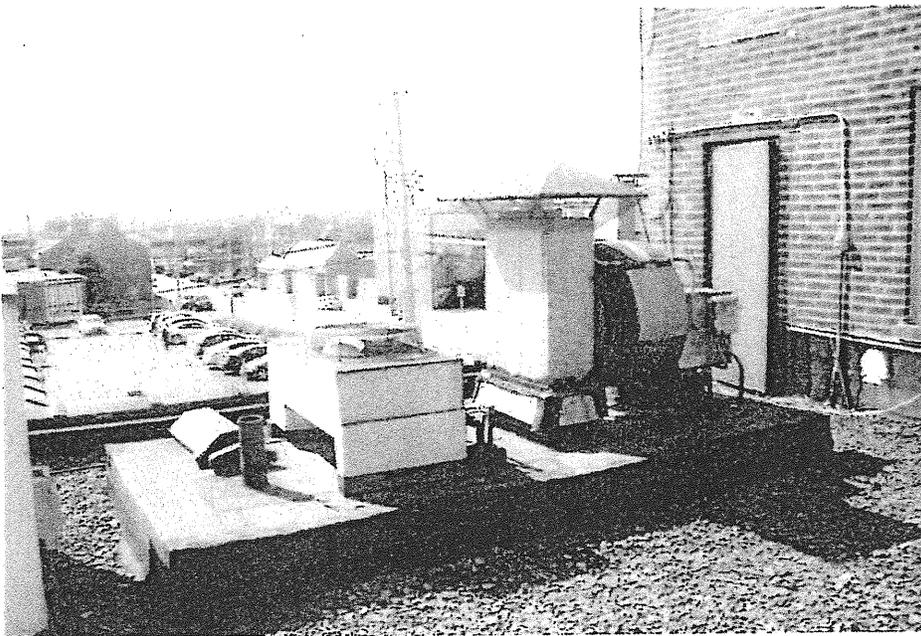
Partial view of roof-top mechanical equipment on second story roof.
